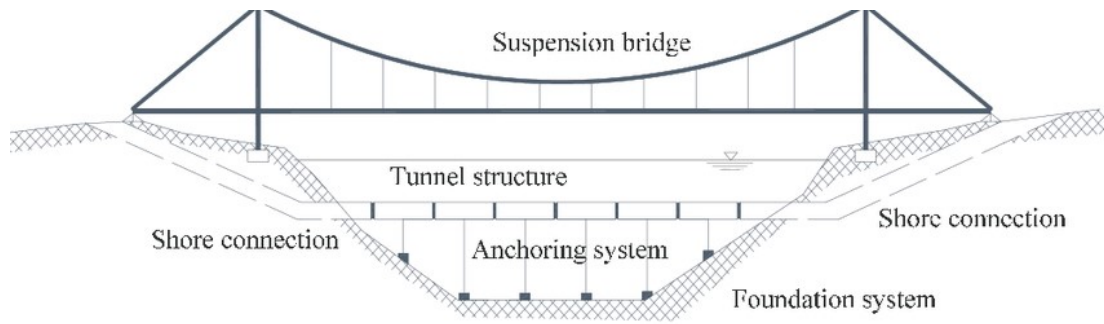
Typical Submerged Floating Tunnel and Suspension Bridge
